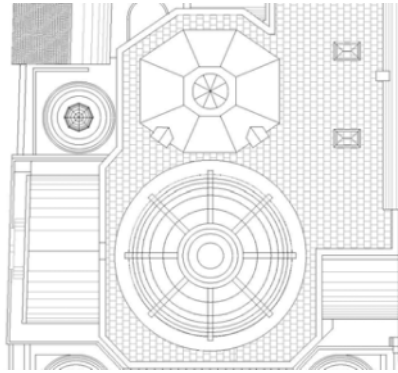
Quito, San Francisco church, detail of roof plan, presbytery and side chapel domes (IMP 2003).
